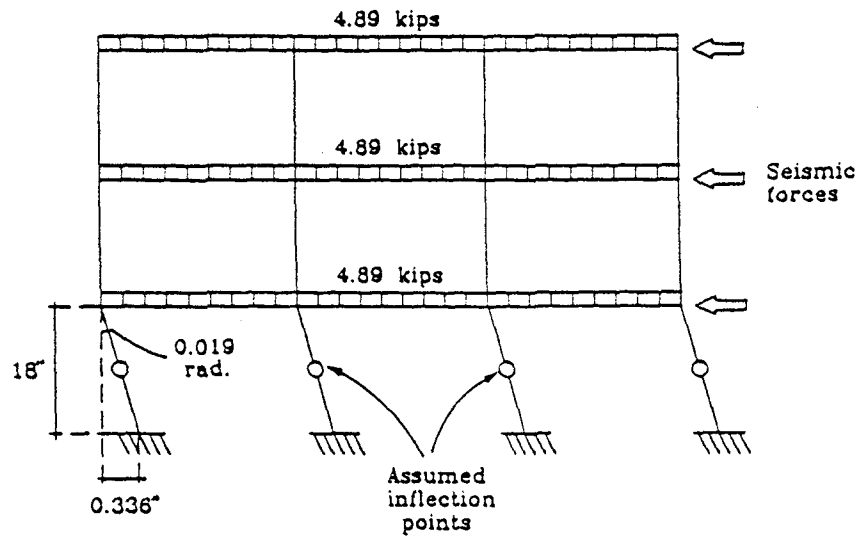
Second Story Columns Shear (Run Taft 0.18-G).
